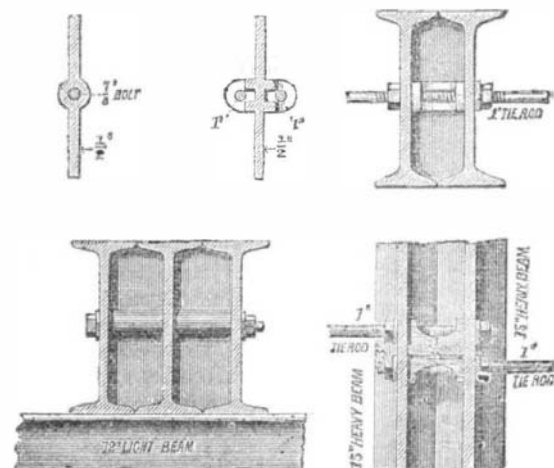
THE UNDERGROUND RAILWAY, NEW YORK CITY.—JOINTS AND COUPLINGS OF THE IRON BEAMS.
